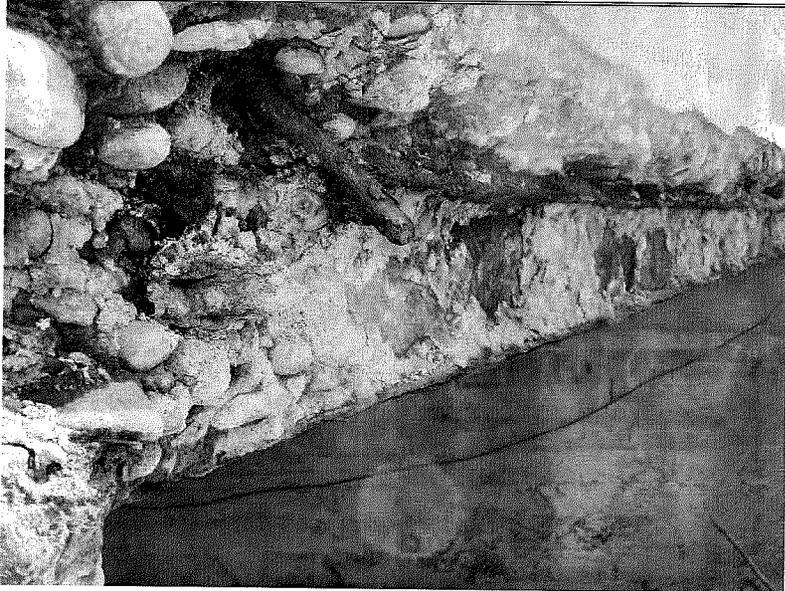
Downstream culvert barrel roof with exposed deteriorated steel beams and concrete loss of section.
